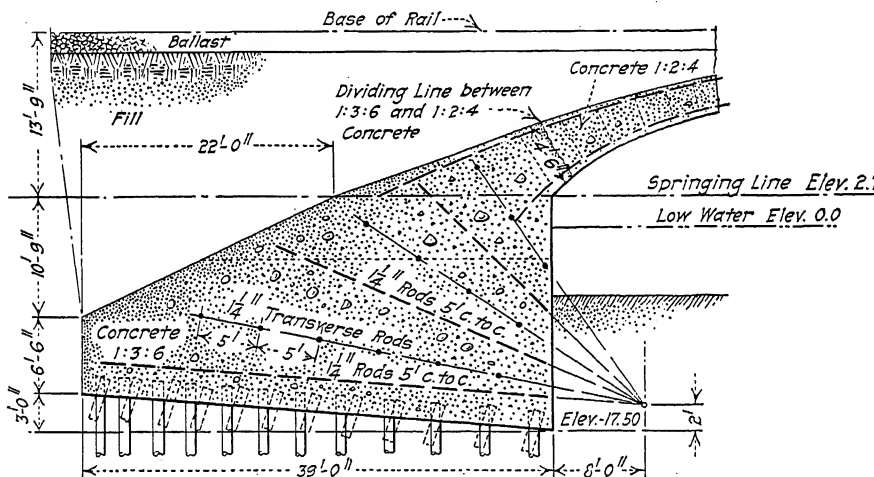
Abutment of causeway arch construction, Galveston, Texas.
